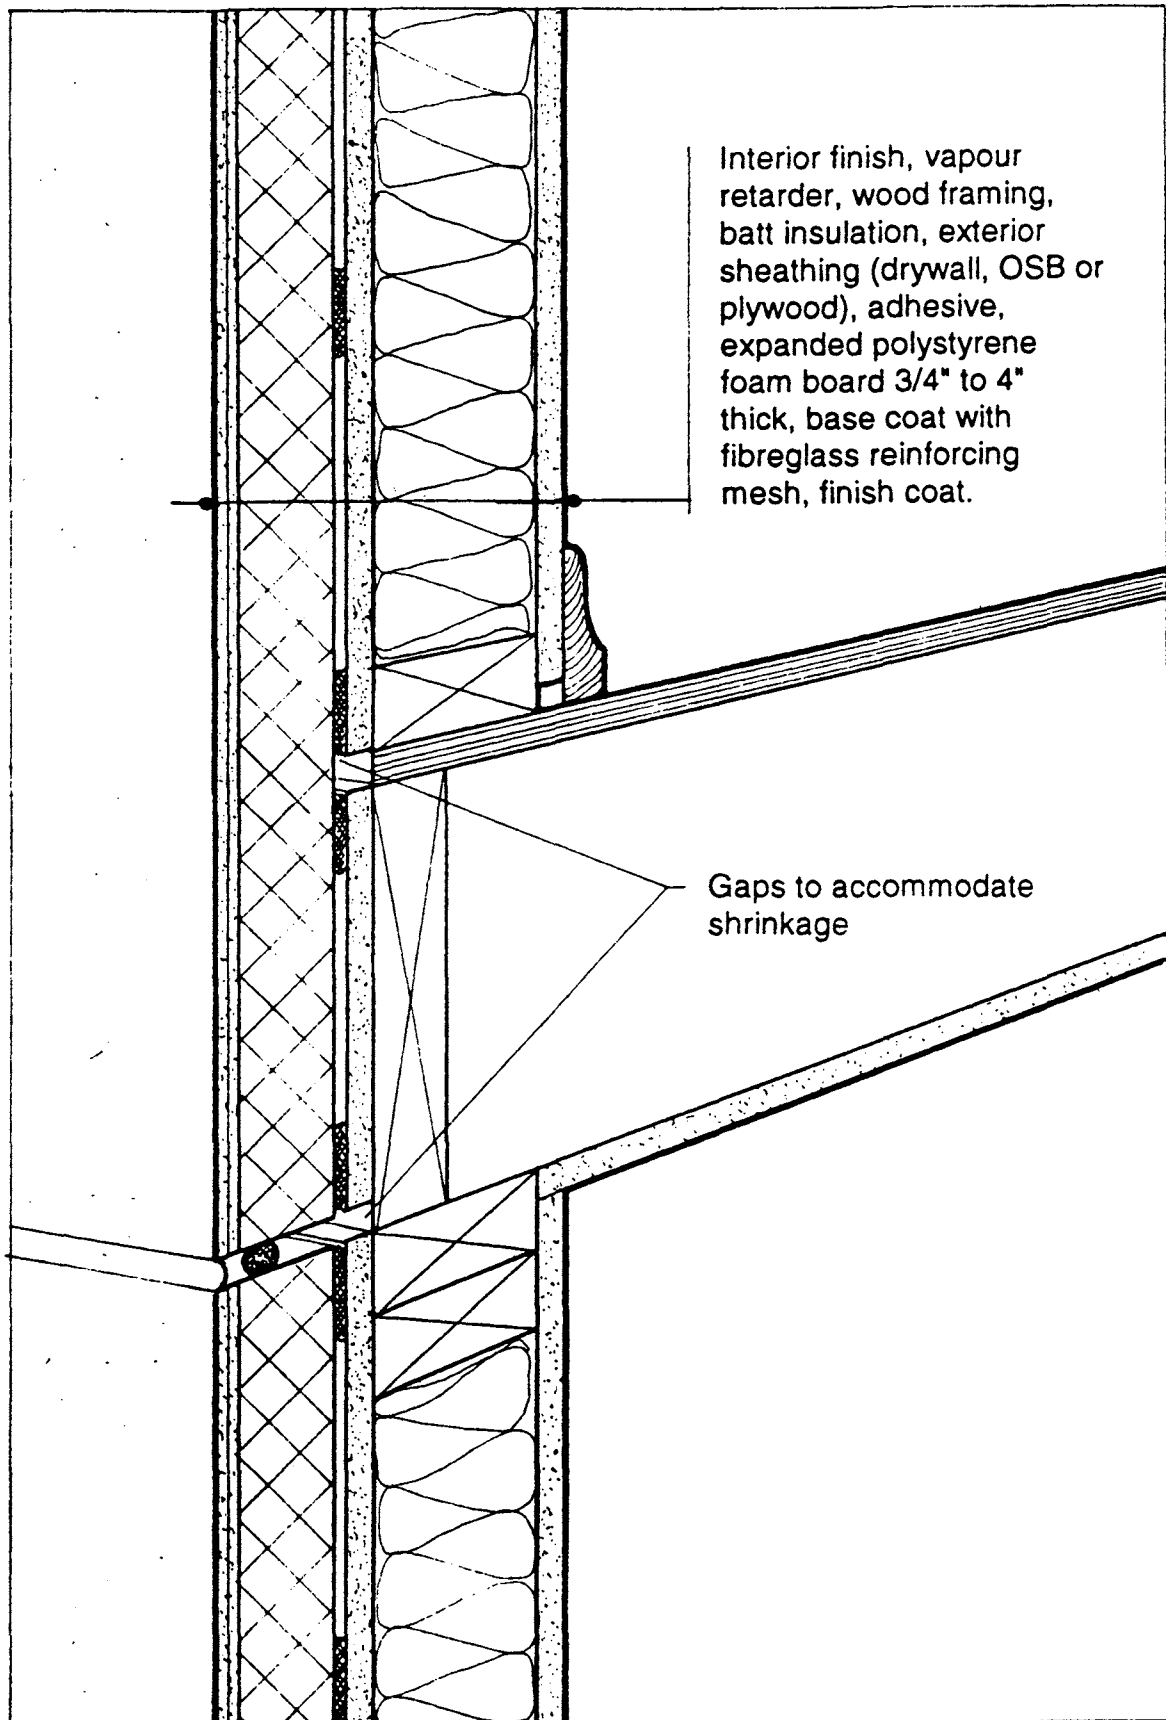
TYPICAL EIF SYSTEM APPLIED TO WOOD FRAMING
